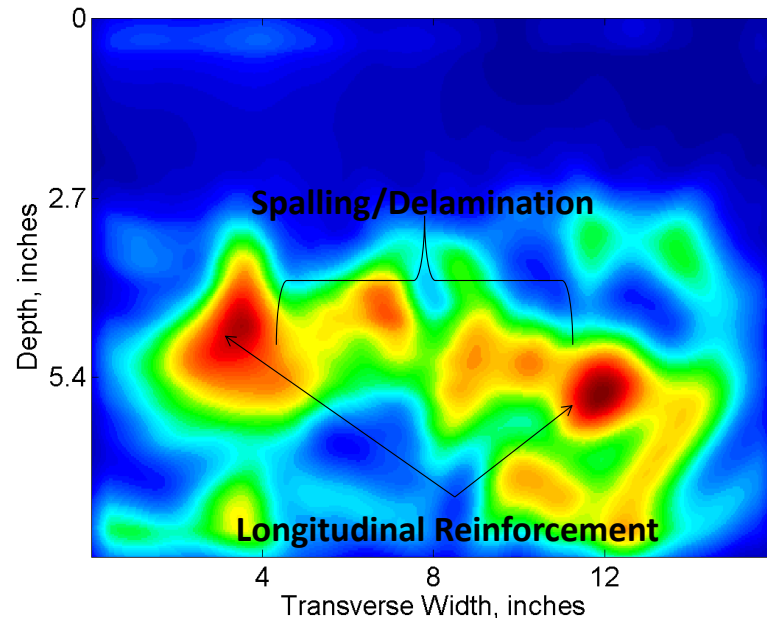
Direct reflection indicating a damaged concrete condition at the depth of the CRCP reinforcement.
